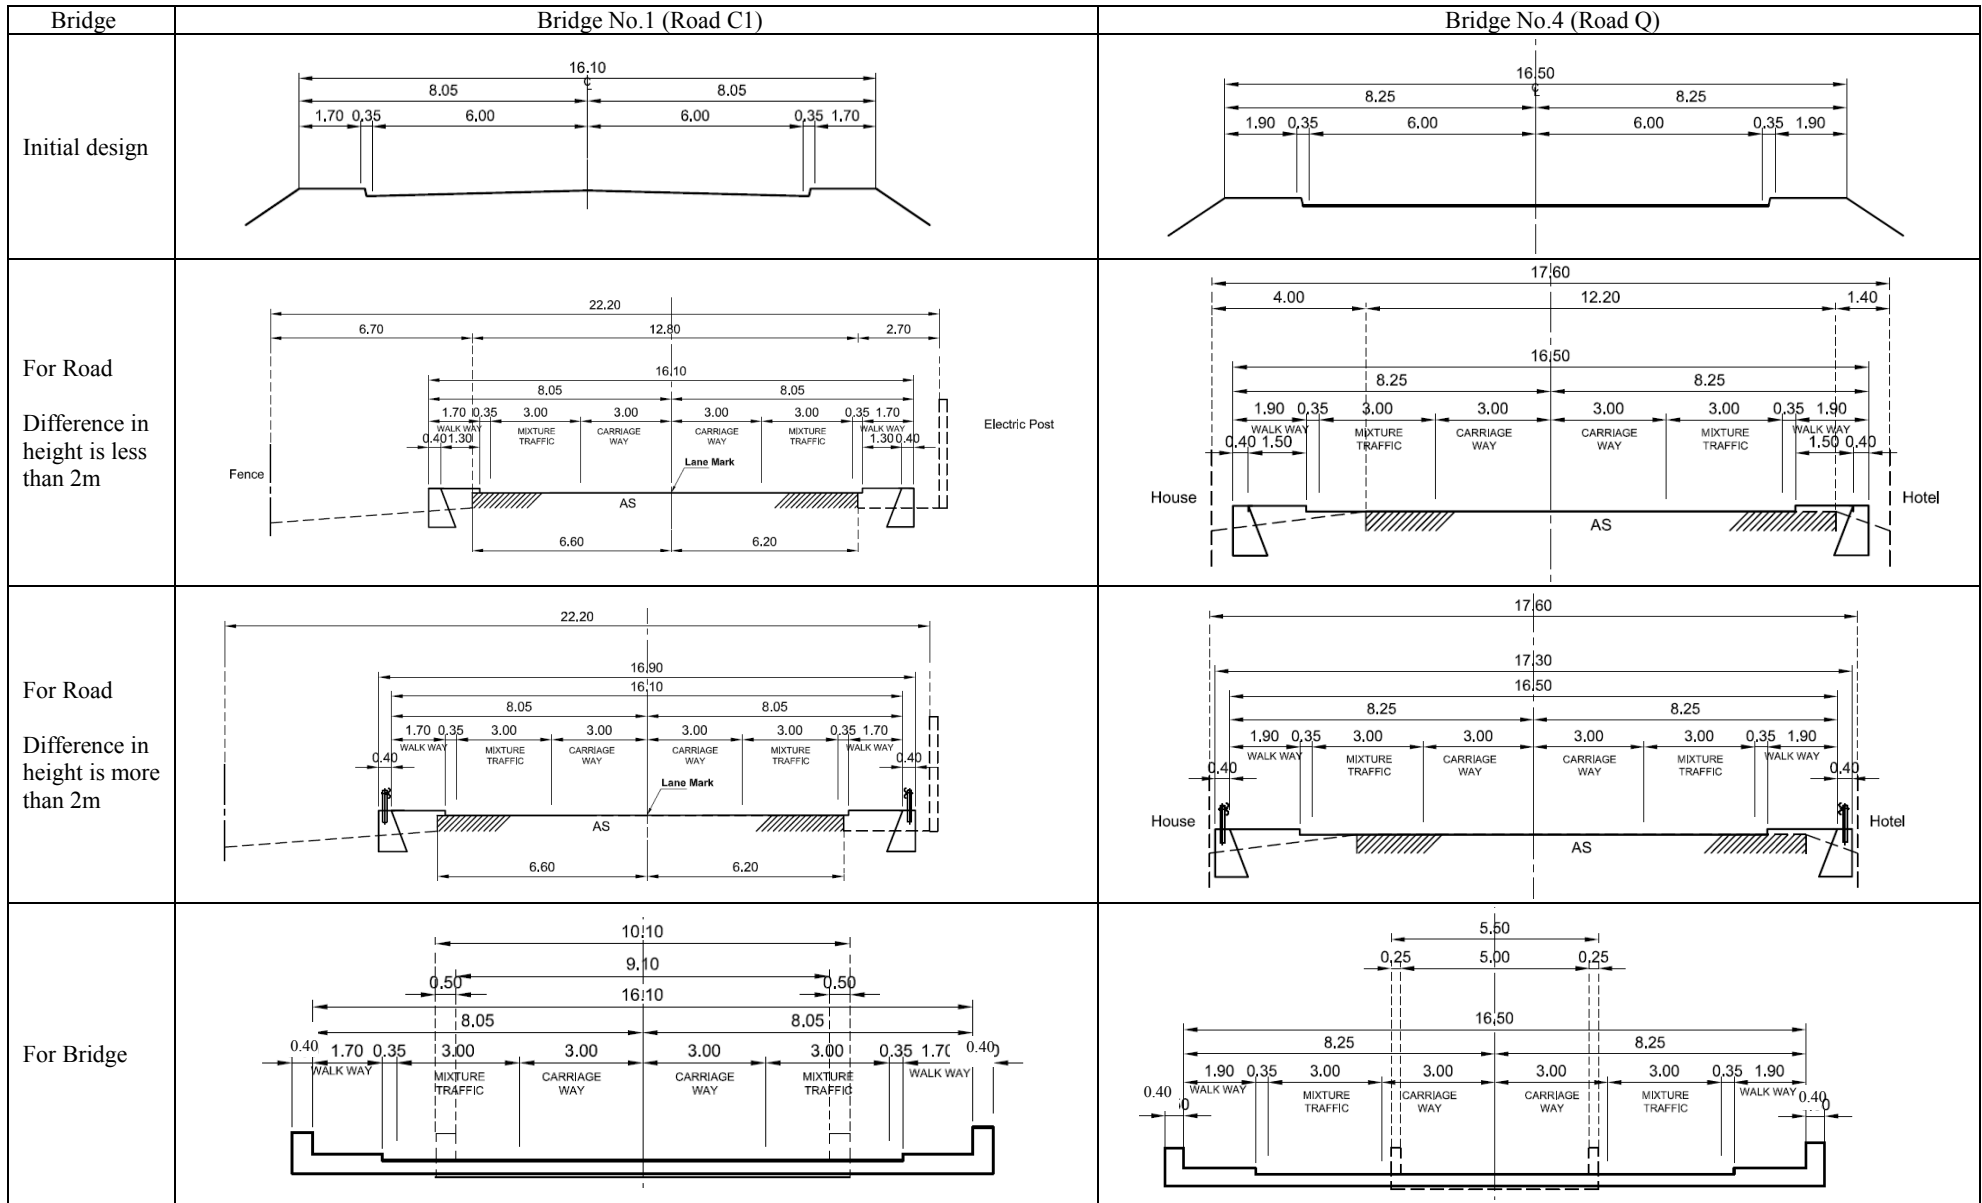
Typical Cross Section of Each Bridge (1/2)
